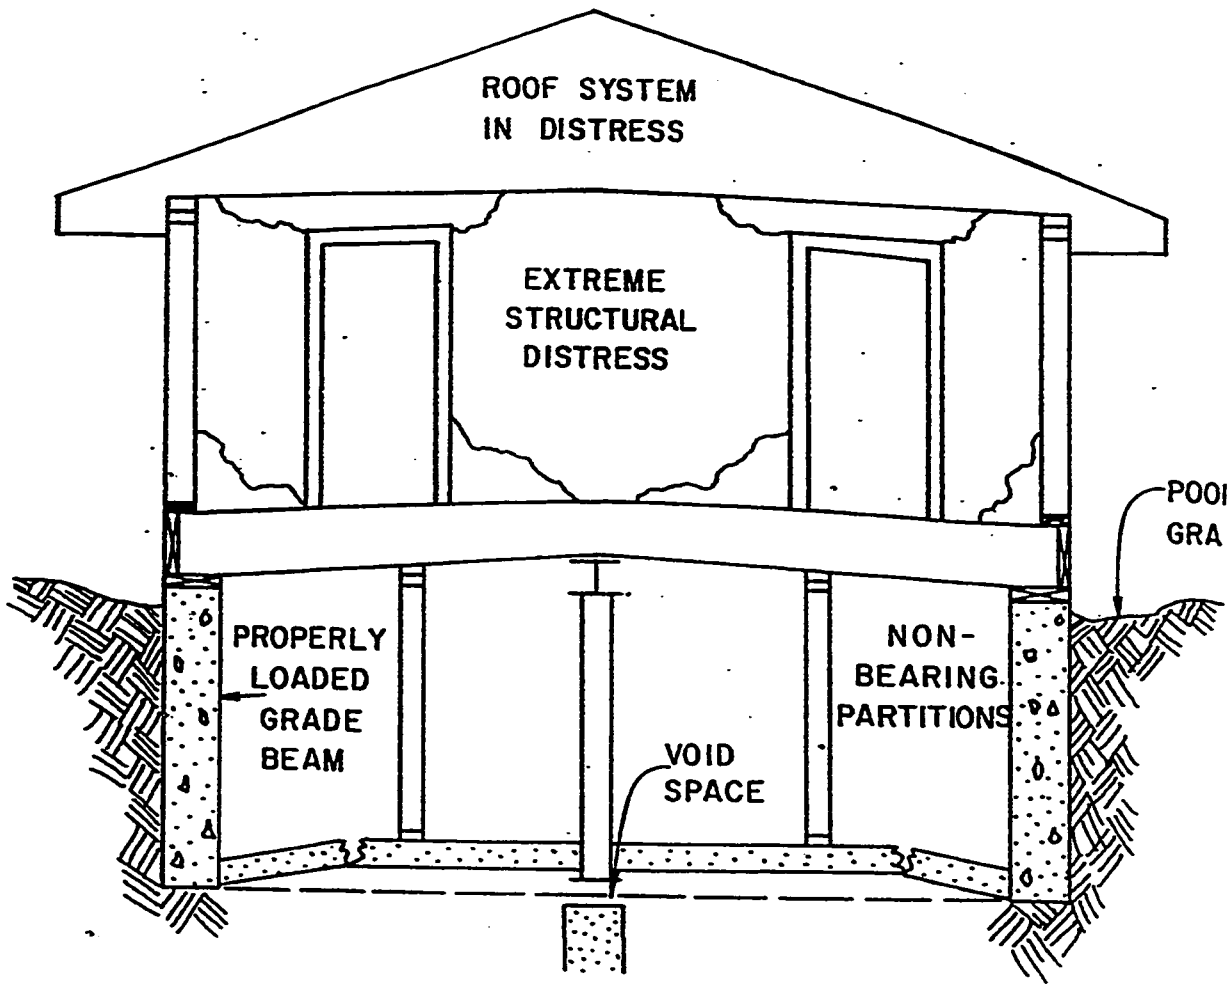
TYPICAL MAJOR HOUSE DAMAGE
